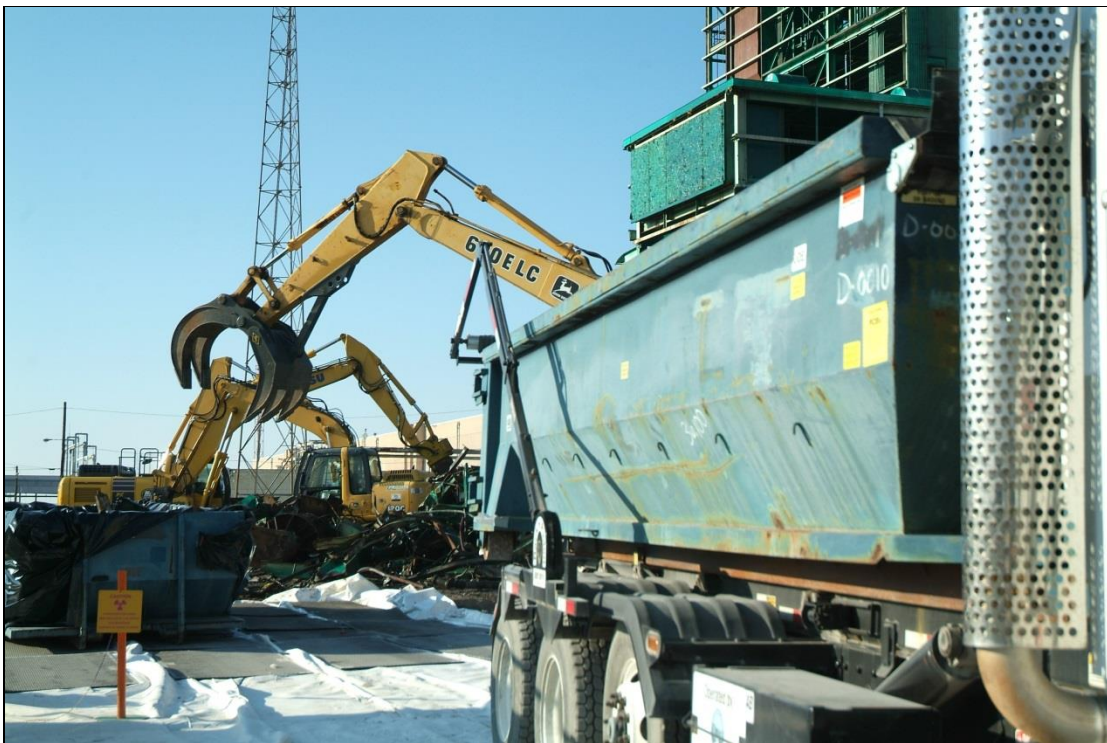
Excavators Load Debris from the C-340-B Building into Roll-off Bins in Background (Loaded bins are transported to the railcar loading area for transfer into gondolas for off-site shipment. Bins are plastic-lined and waste is covered when leaving the area.)
